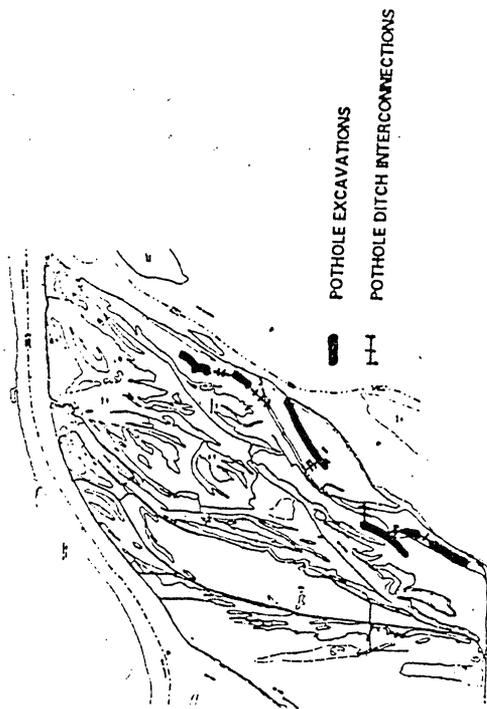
MEANDER SCAR IMPROVEMENT--EXCAVATION & DITCH ALTERNATIVES
